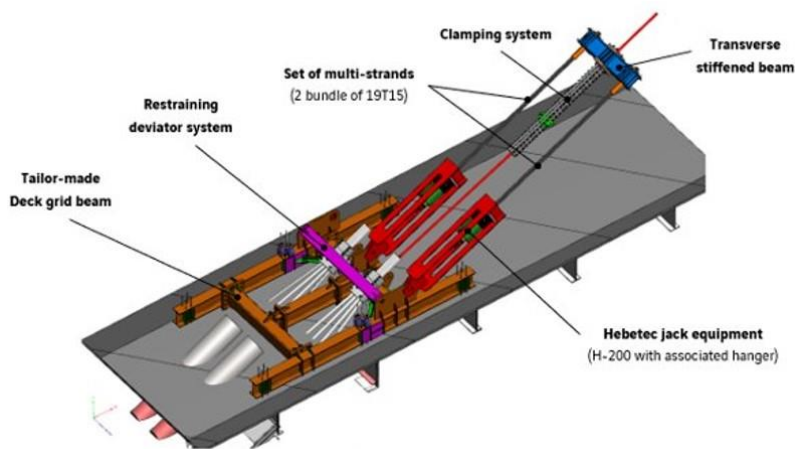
Bespoke detensioning layout allowing to bypass the most damaged cable section at deck level
